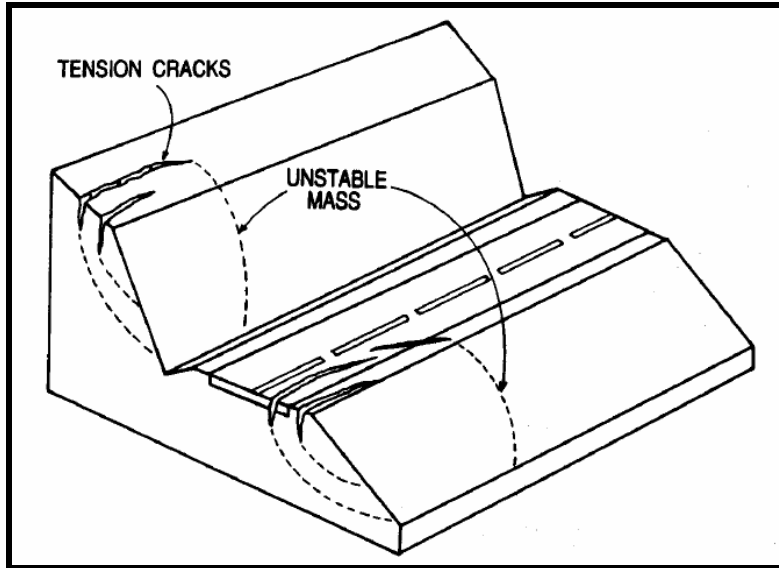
Development of tension cracks at top of roadway or cut slope (FHWA, 1988)
